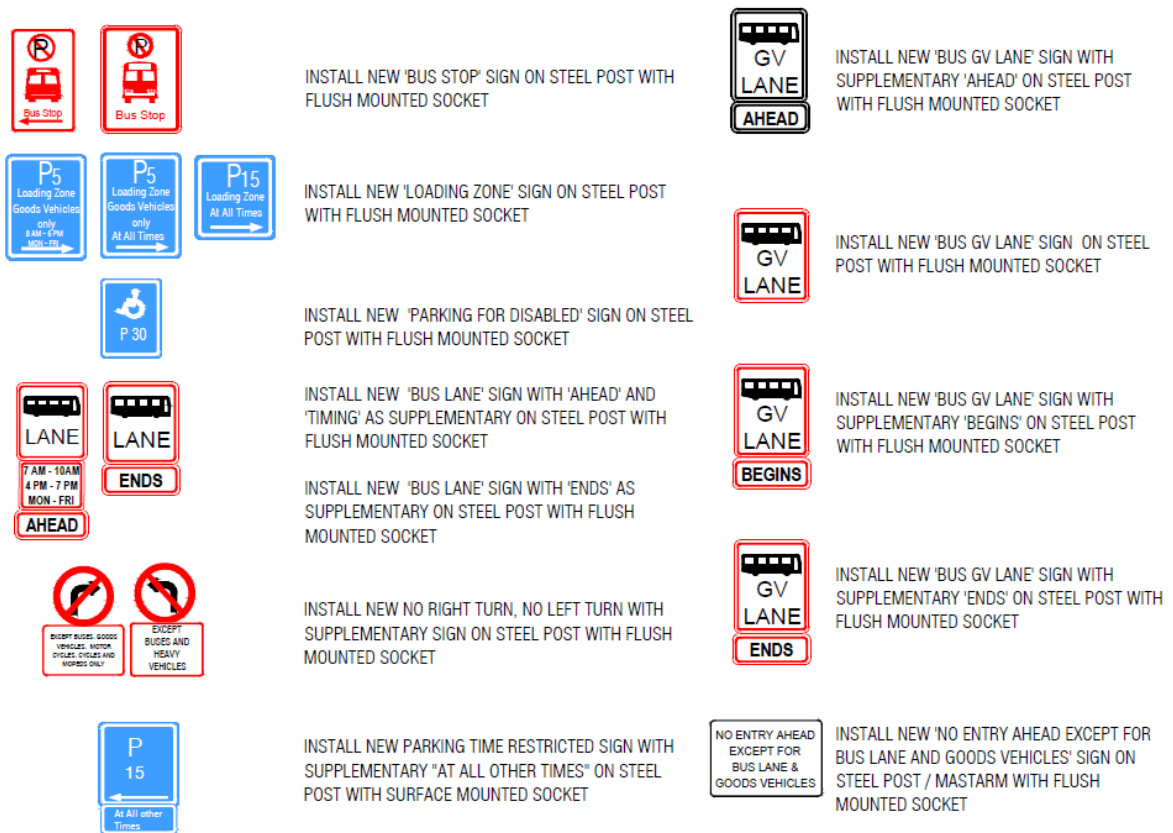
EVA signage provided by Auckland Transport (AT Traffic Signs and Roadmarkings Plan Sheet -2021-PTM-16\_G130
